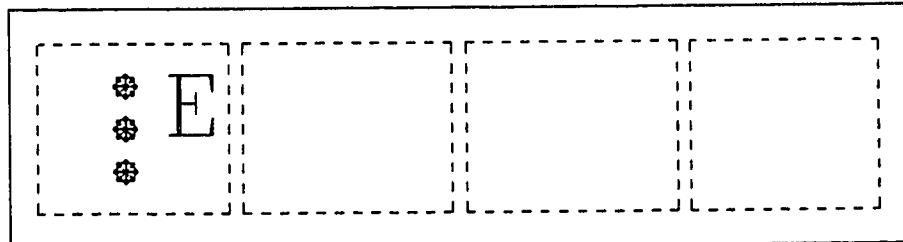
Beam A-1, Demec gauge placement on Panel E
